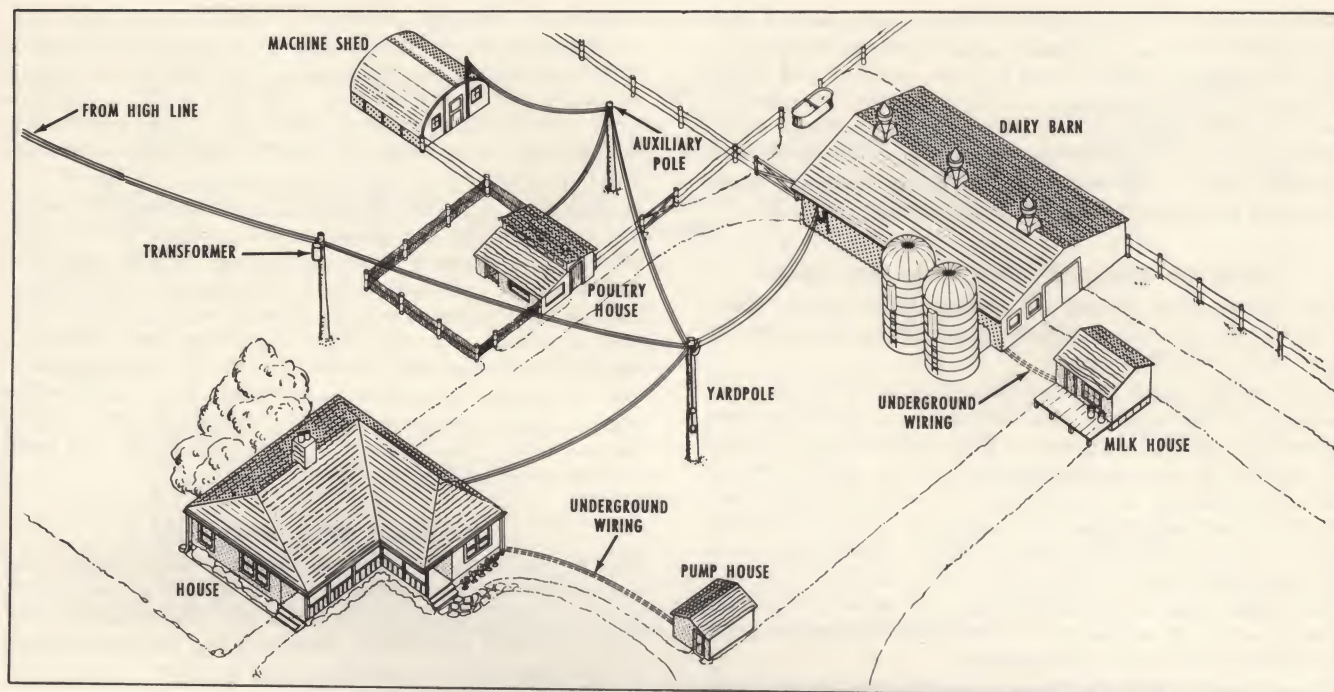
TYPICAL EXTERIOR FARM WIRING
